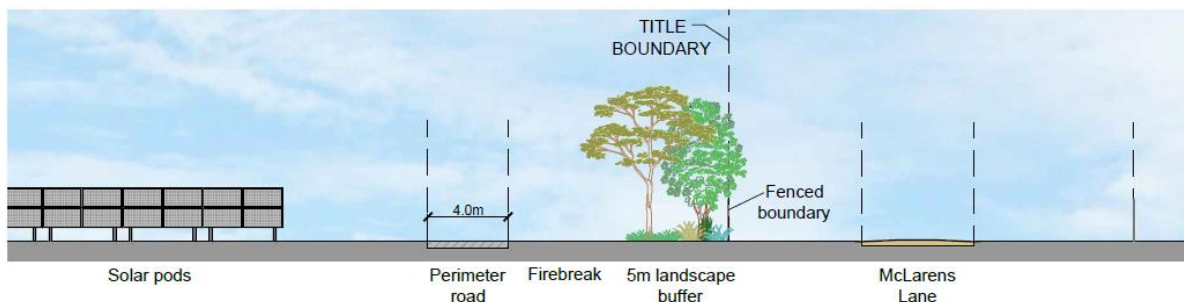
Cross Section C-C View from McLarens Road looking east to the subject site.
